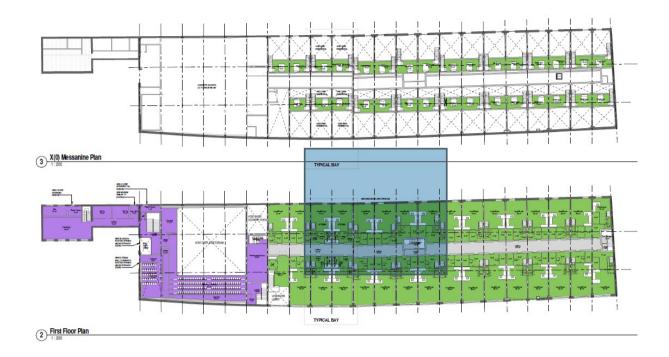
The first floor and mezzanine floor plans demonstrate the proximity of the live/work residential units to the performance and arts hall.
